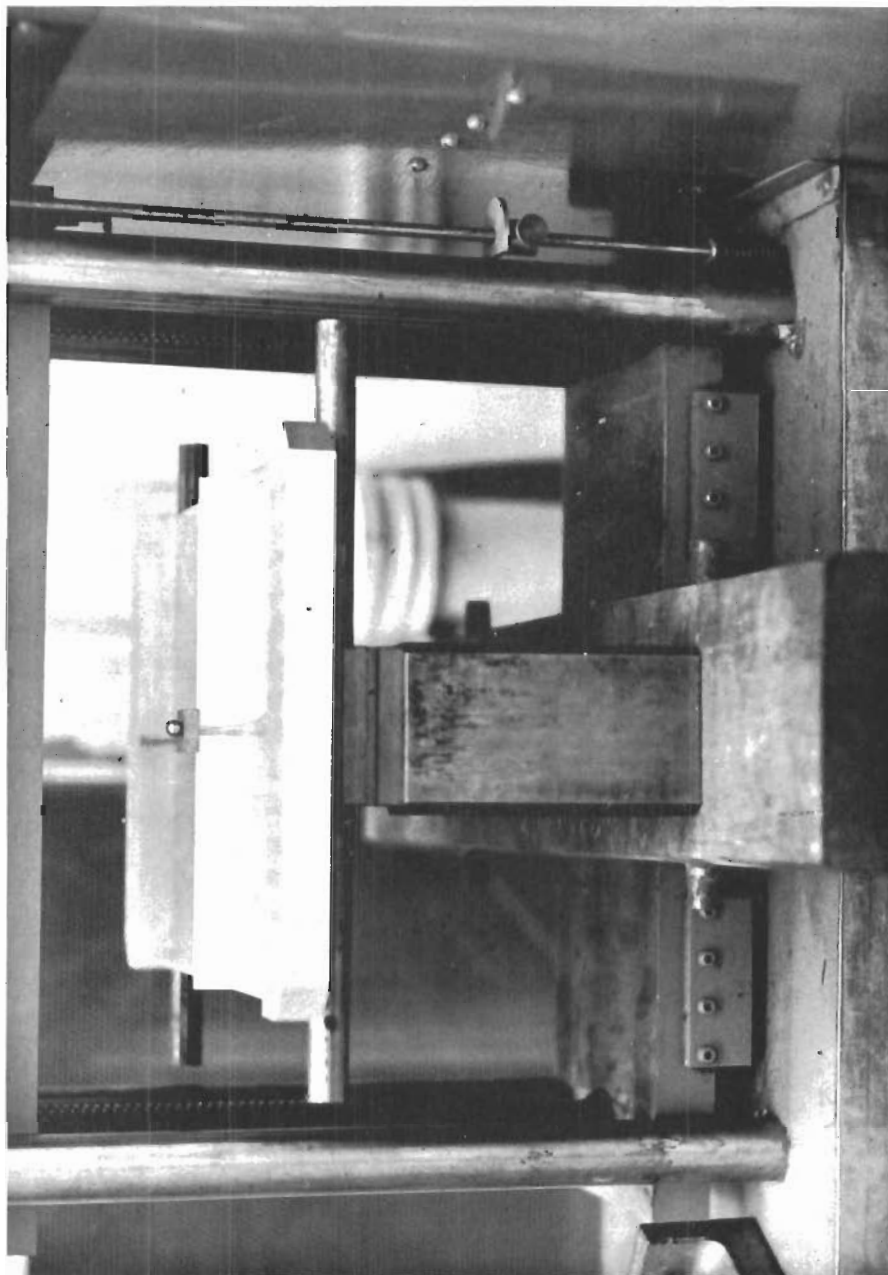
Stiffened Plate No. 1, Transverse Load Test.
